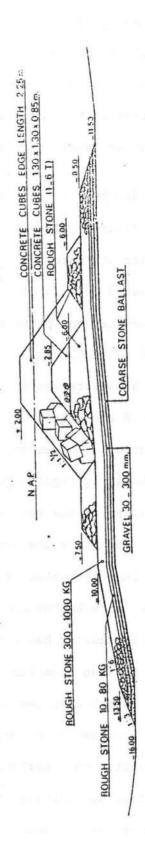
Cross-Section of the Pier at Ymuiden (Old Construction)
